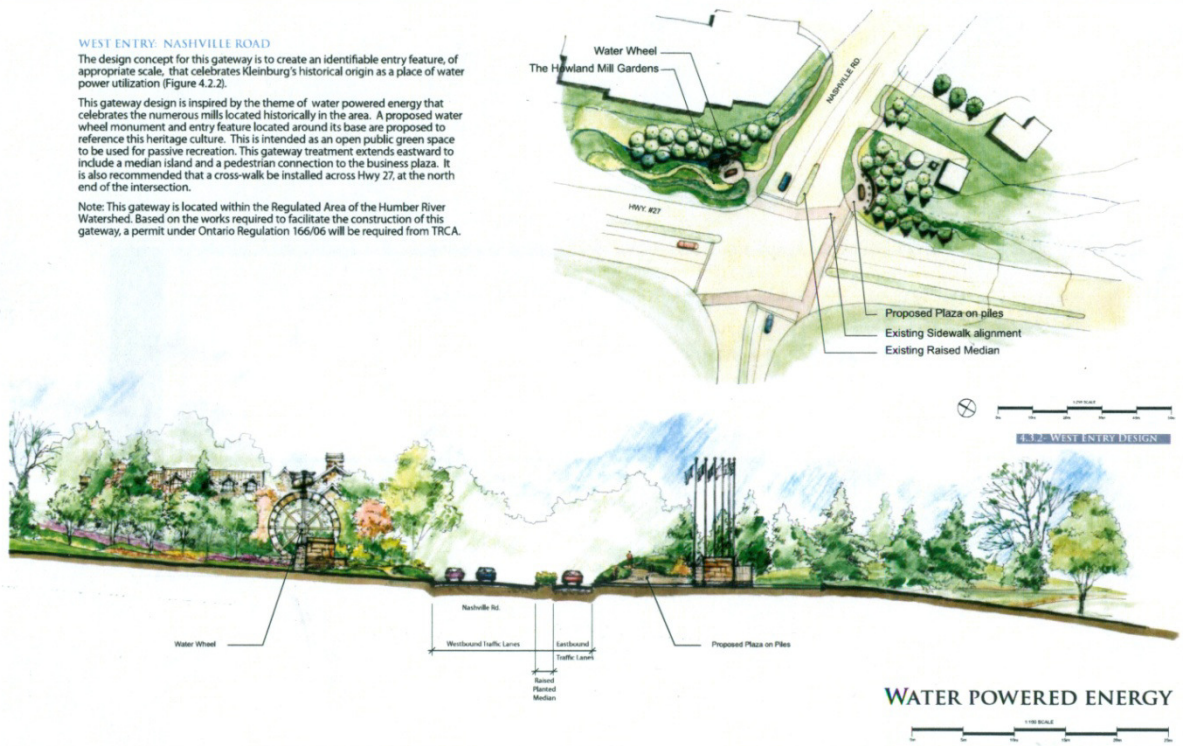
Proposed commemorative feature at Highway 27-Nashville Road intersection, from the 2011 Village of Kleinburg, Islington Avenue Streetscape, Master Plan Study. On the plan, the barn on the right is near the property line of the proposed development. In the elevation, the development will be behind the trees on the right.
